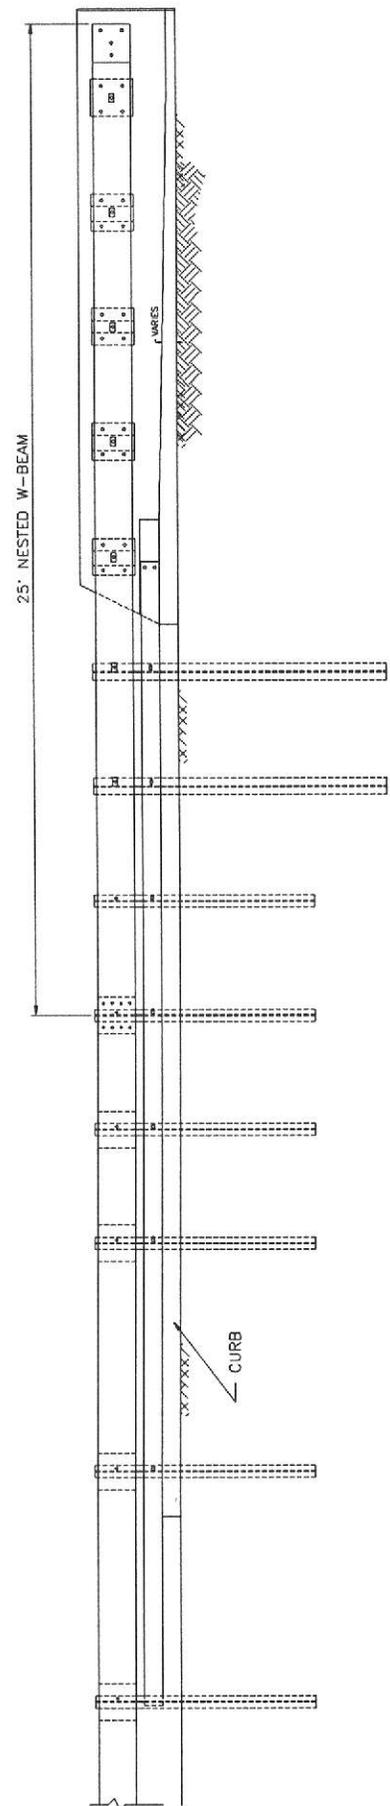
ADOT steel post transition with curb, rubrail, and nested W-beam.
